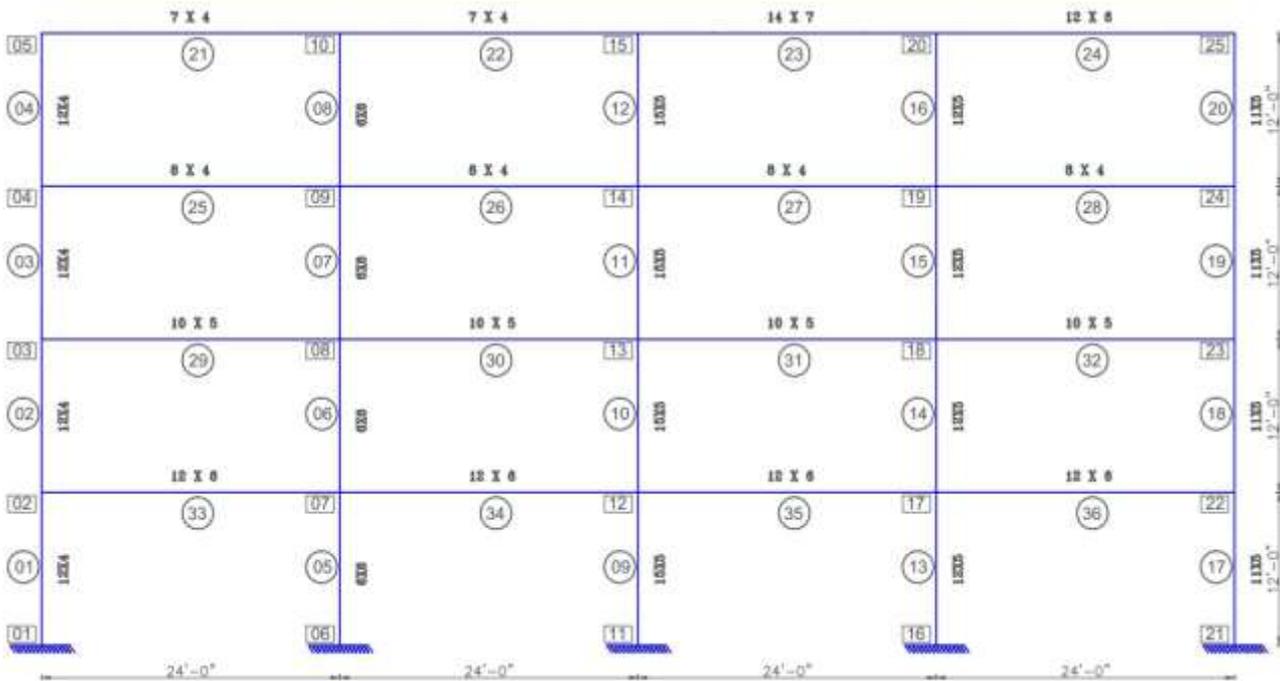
Final optimized member sections for beams and columns of 4-bay 4-storey concrete frame structure
